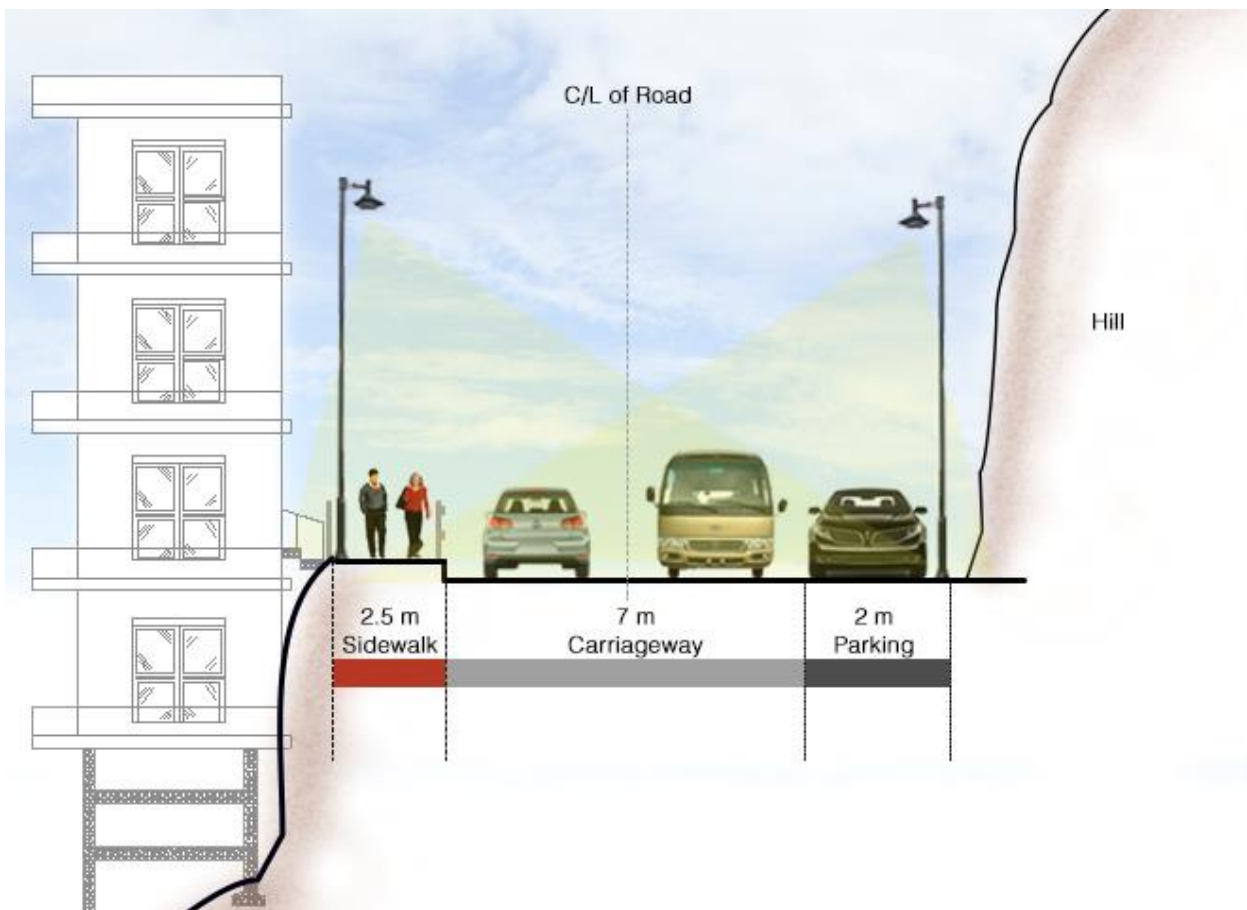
Proposed cross section of moderate volume 12M road and one footpath
